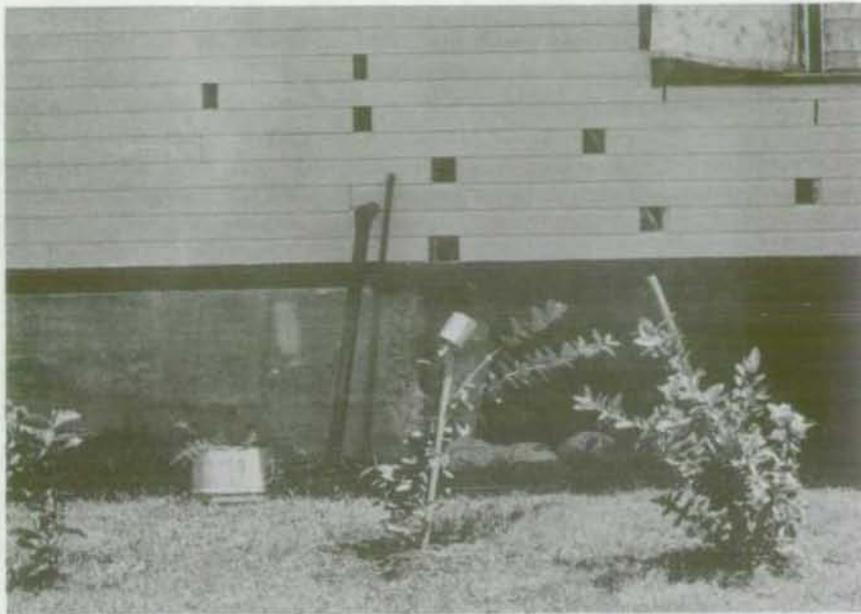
Detail showing how sister's house is held by concrete pier beneath rear wing.
